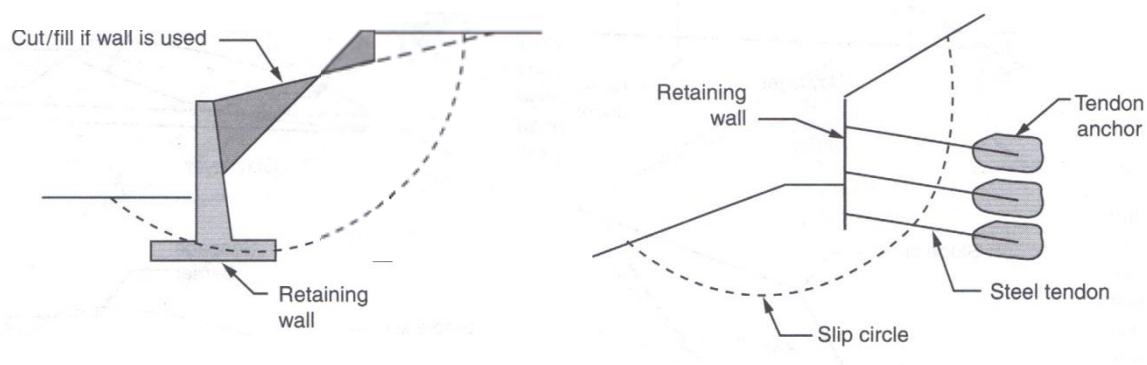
Examples of cantilevered wall and tieback anchor wall (Das, 2011).
